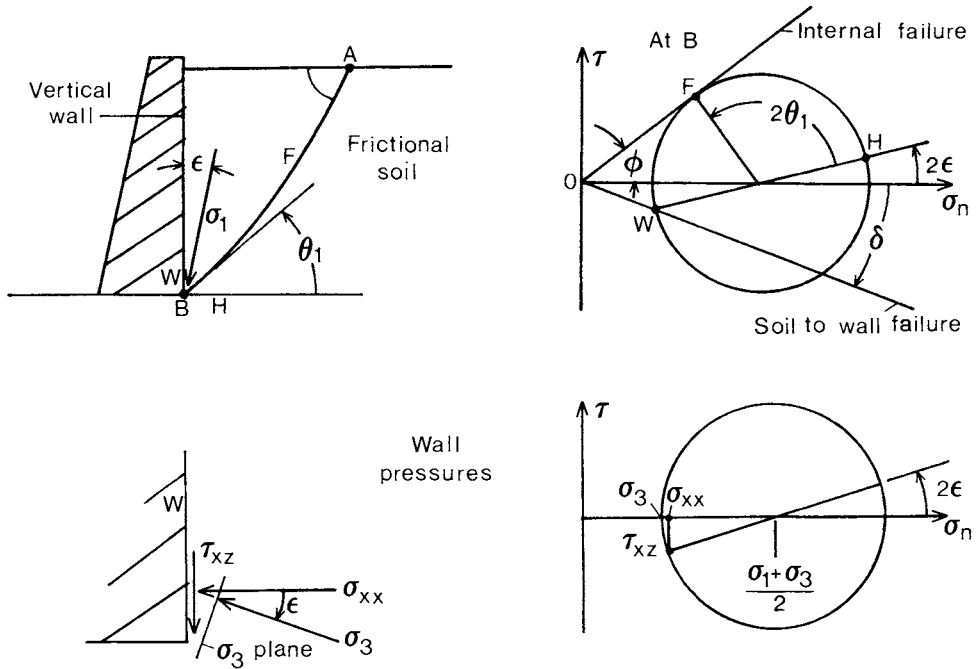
Soil stresses on a retaining wall during active failure.
